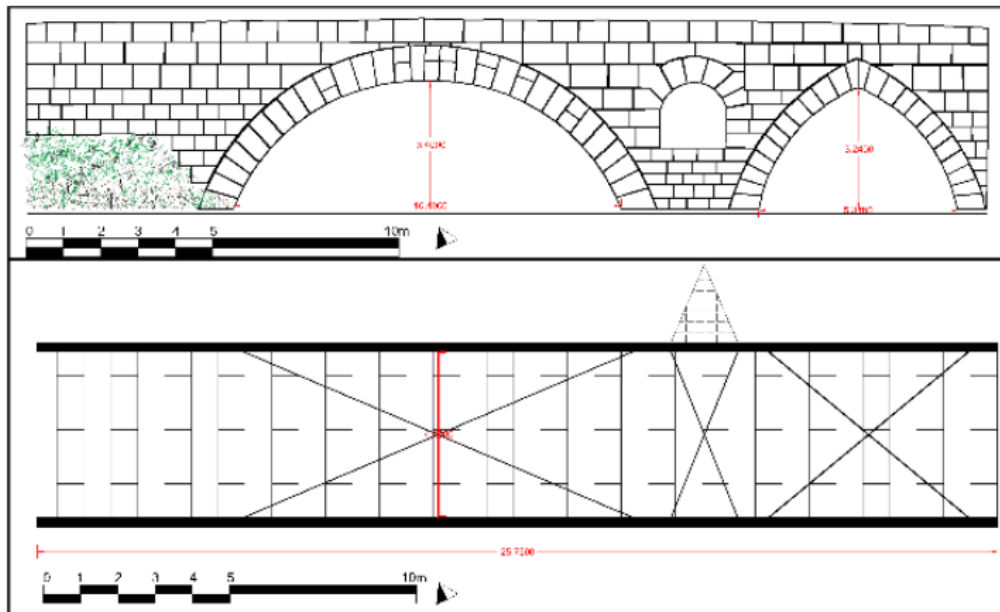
Downstream Façade of the Tozlu Bridge (Drawing: İ. Göçmen)
